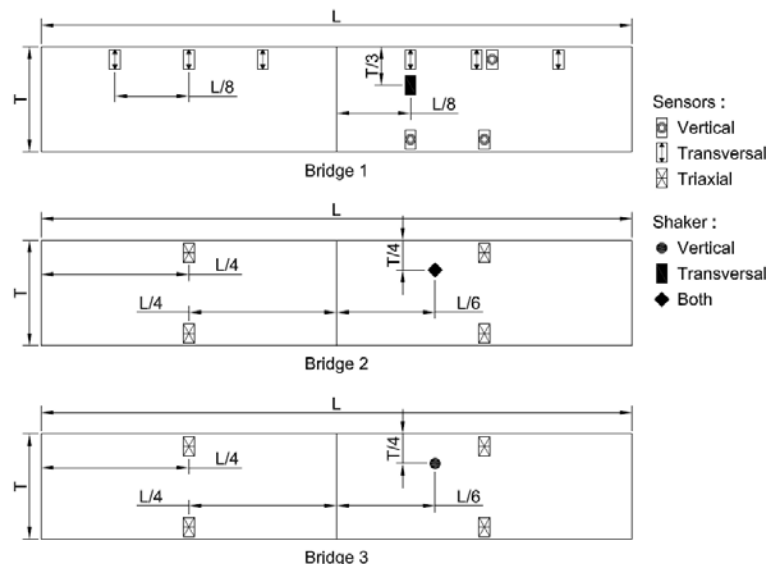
Configuration of forced vibration tests for (a) Bridge 1; (b) Bridge 2 and (c) Bridge 3
